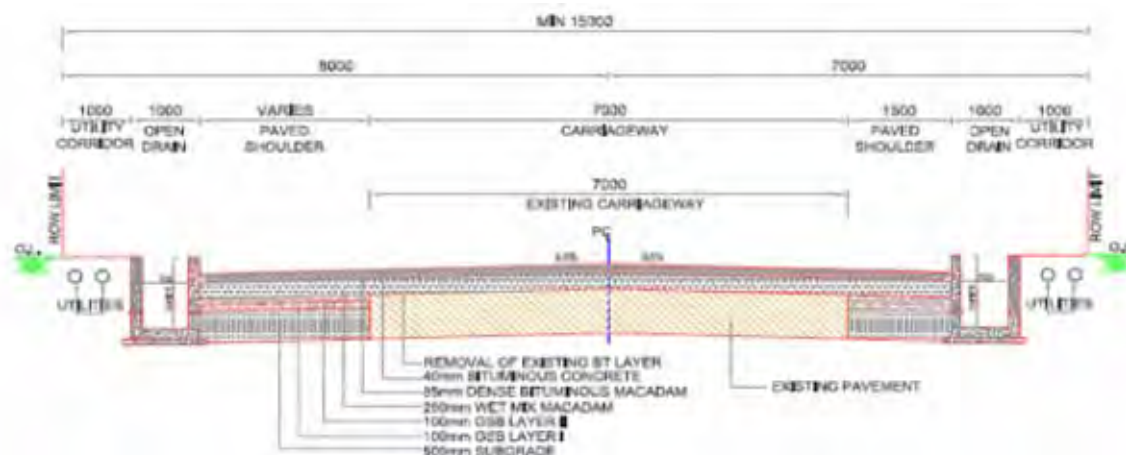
C4-F – O Two Lane Carriageway with Paved Shoulder in Forest section - RHS (Over lay)
